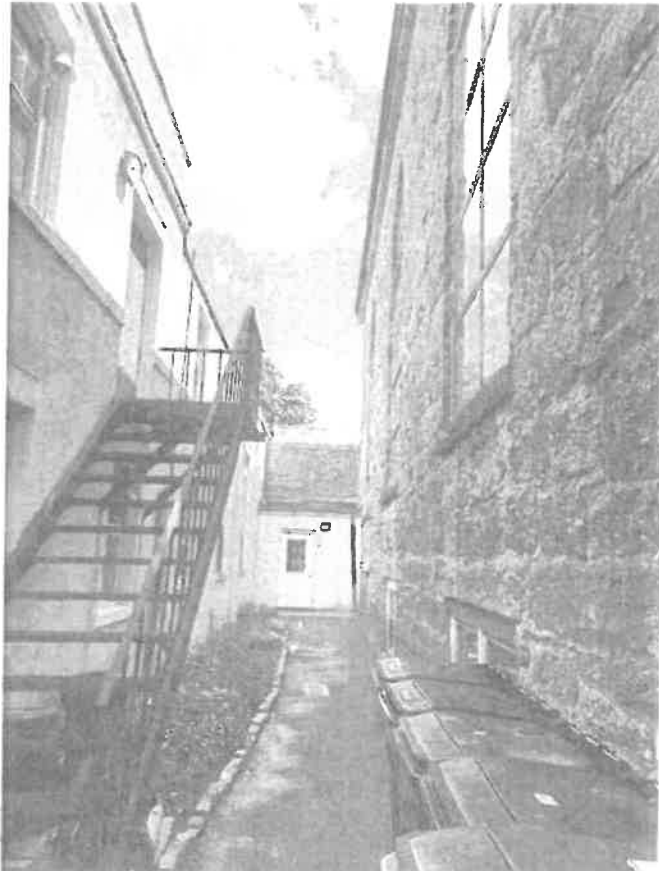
Parish House connection in rear with Church North Elevation on right and Parish House South Elevation on left – May, 2023
